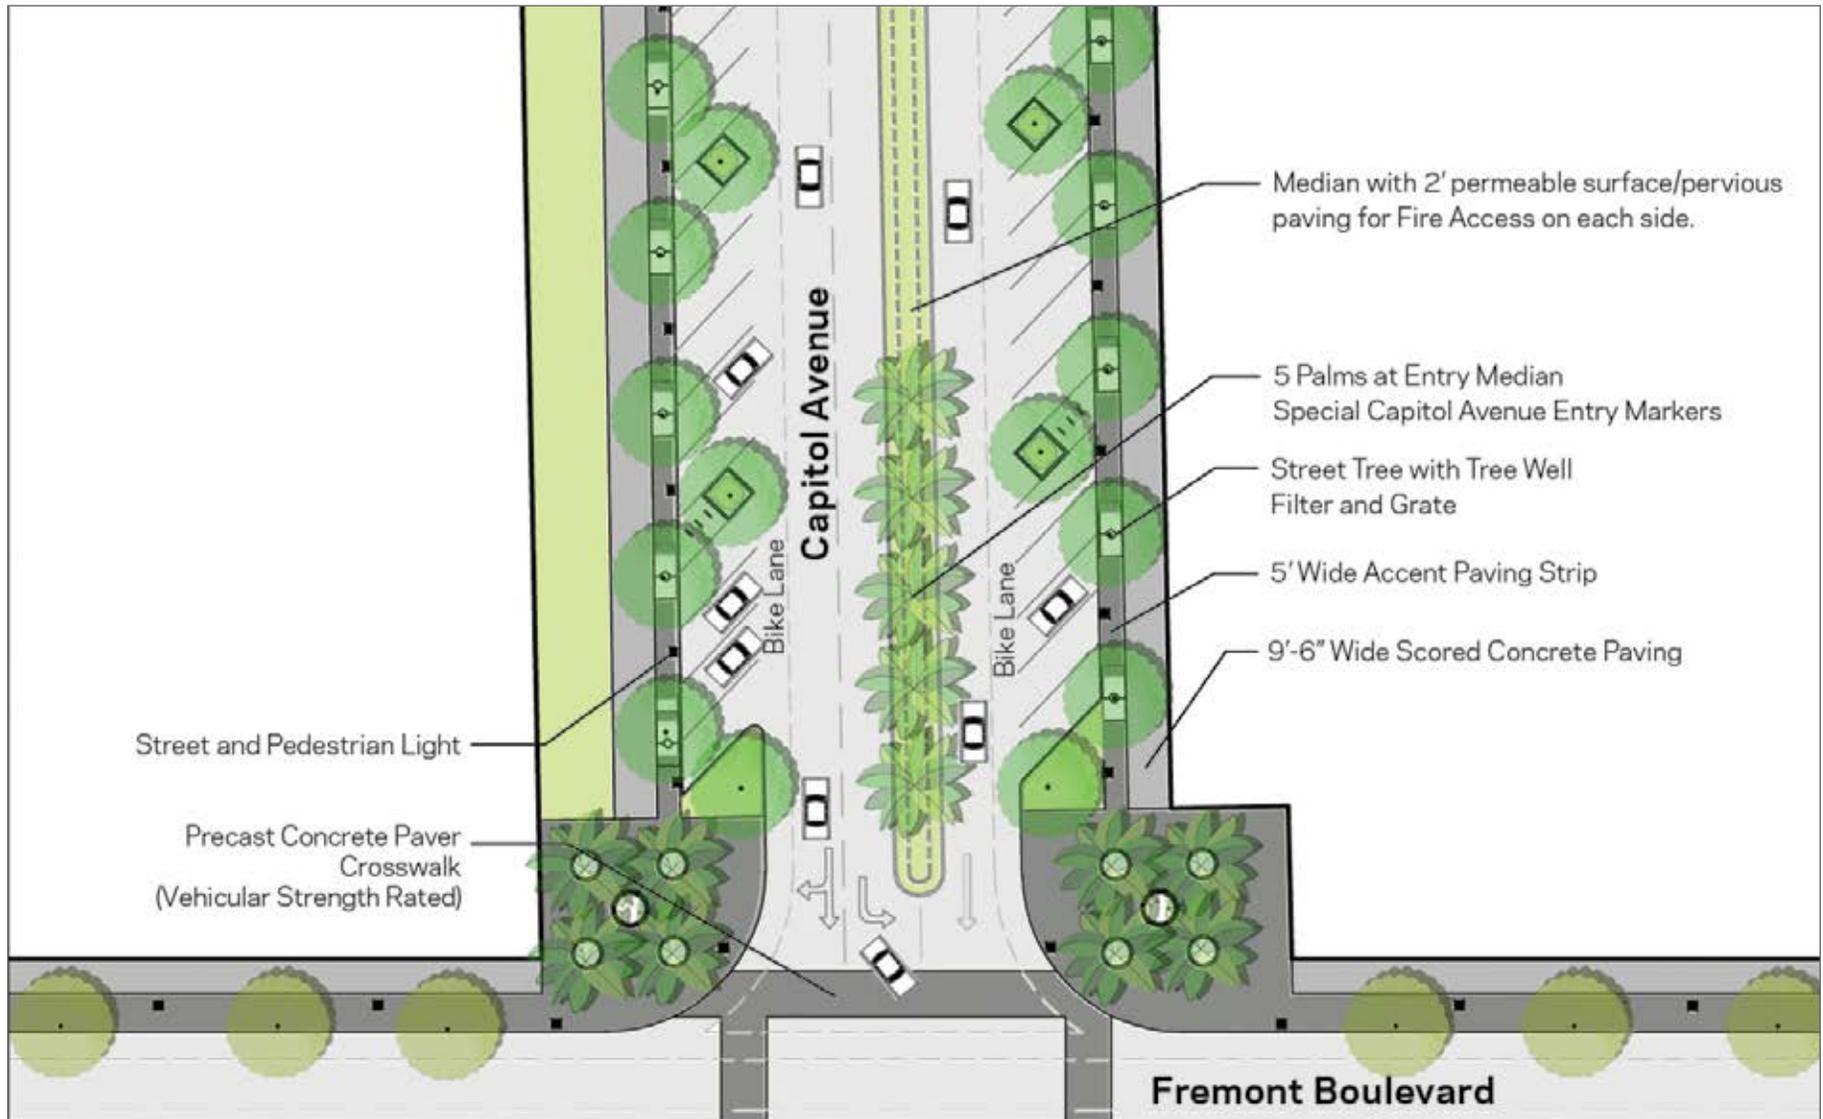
Capitol Avenue West - Street Plan (top)
